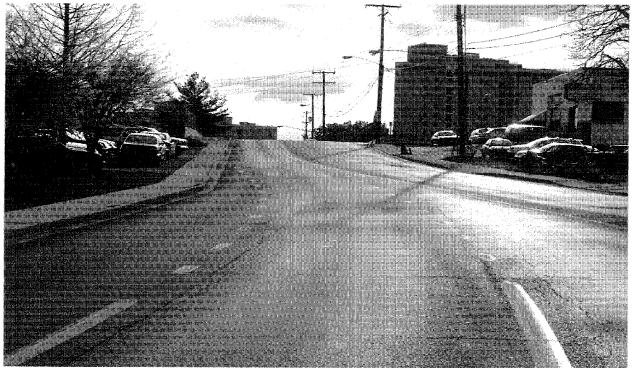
Burlington Avenue (MD 410) westbound from intersection with Fenton Street.
